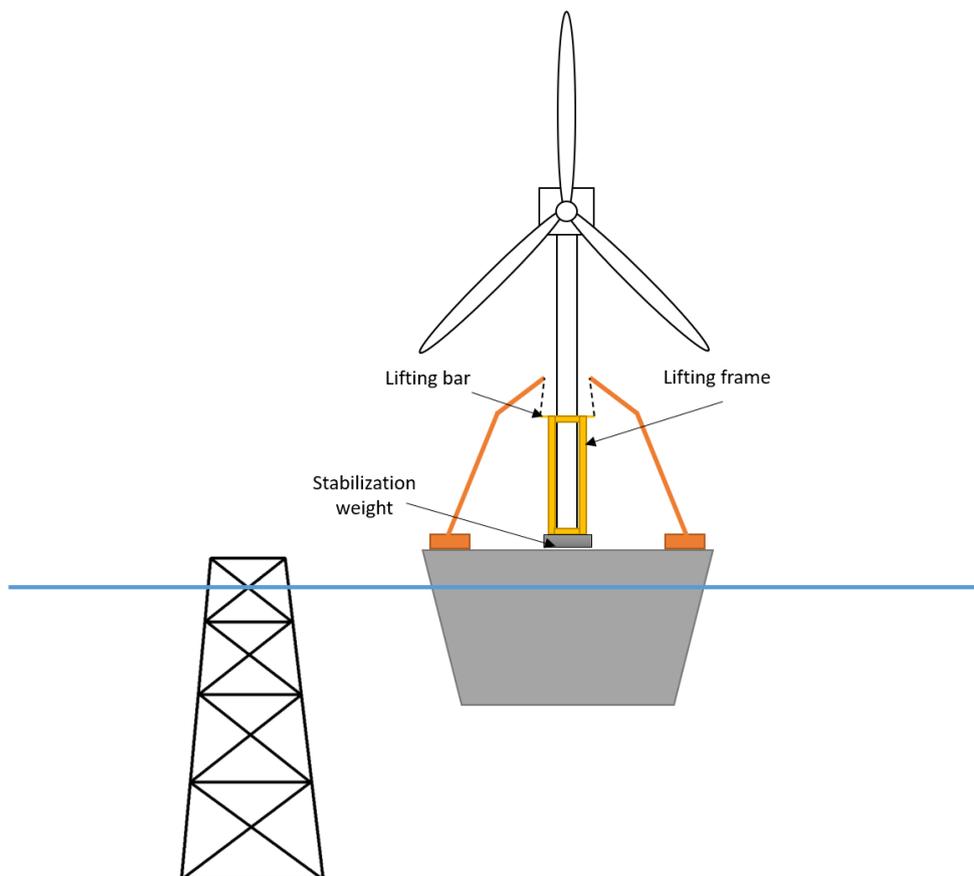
Sketch of workings generated concept 13, Integrated lift using traditional cranes and lifting frame.
